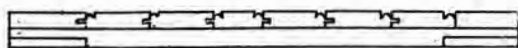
CROSS-SECTION OF FRAMED LEDGE DOOR.
